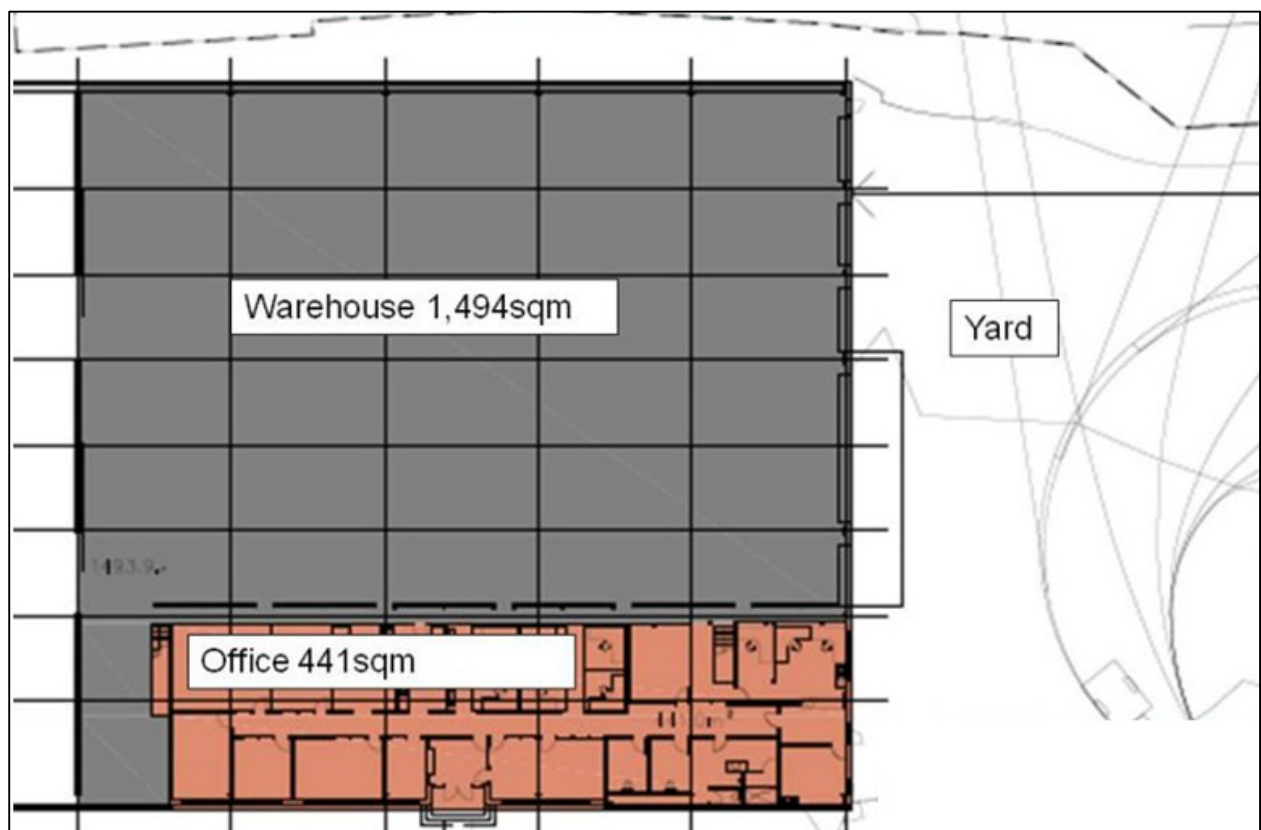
The Existing Site Plan – Previously Occupied by Allied Pickfords
